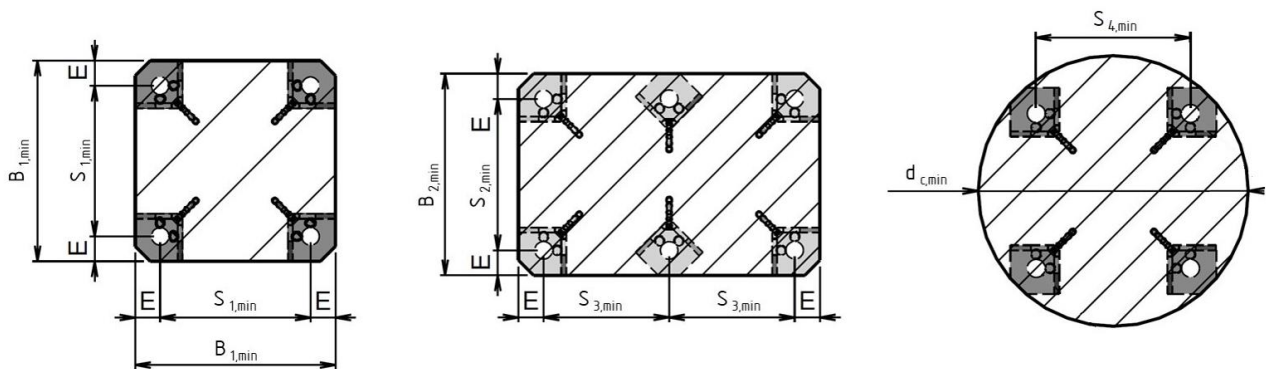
Examples of geometrical arrangements and distances of RECENSE PDP Column Shoe
